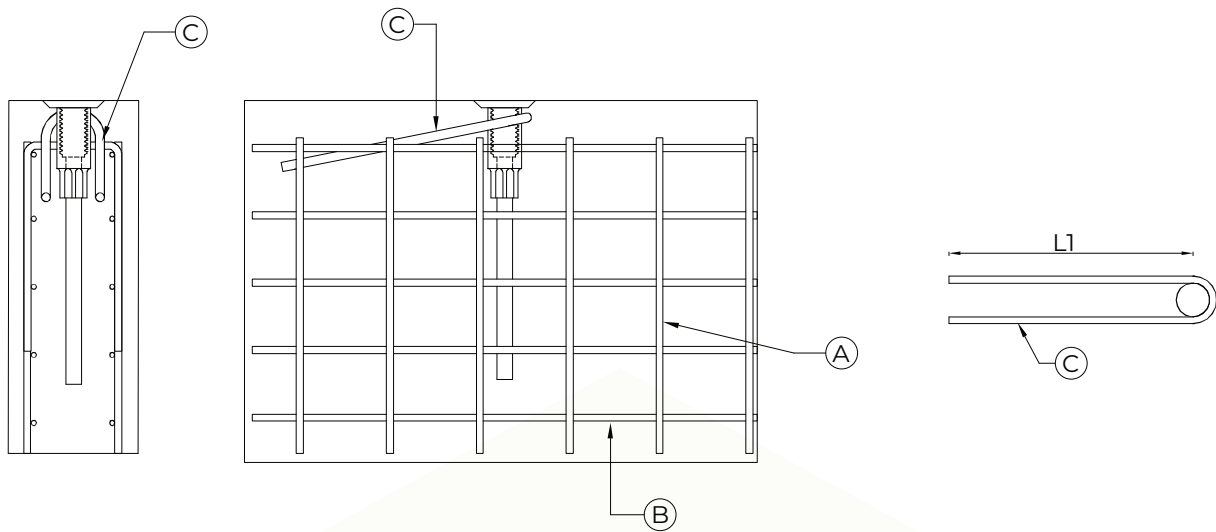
Diagonal Reinforcement for ETS lifting Anchor :
